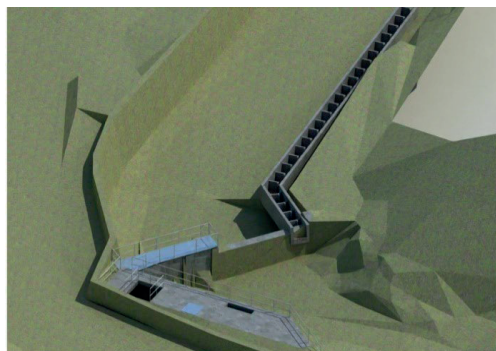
3D rendering of the rehabilitated water intake structure, designed based on topographic and LiDAR measurements, showing the restored weir, retaining walls, and access elements integrated into the terrain
